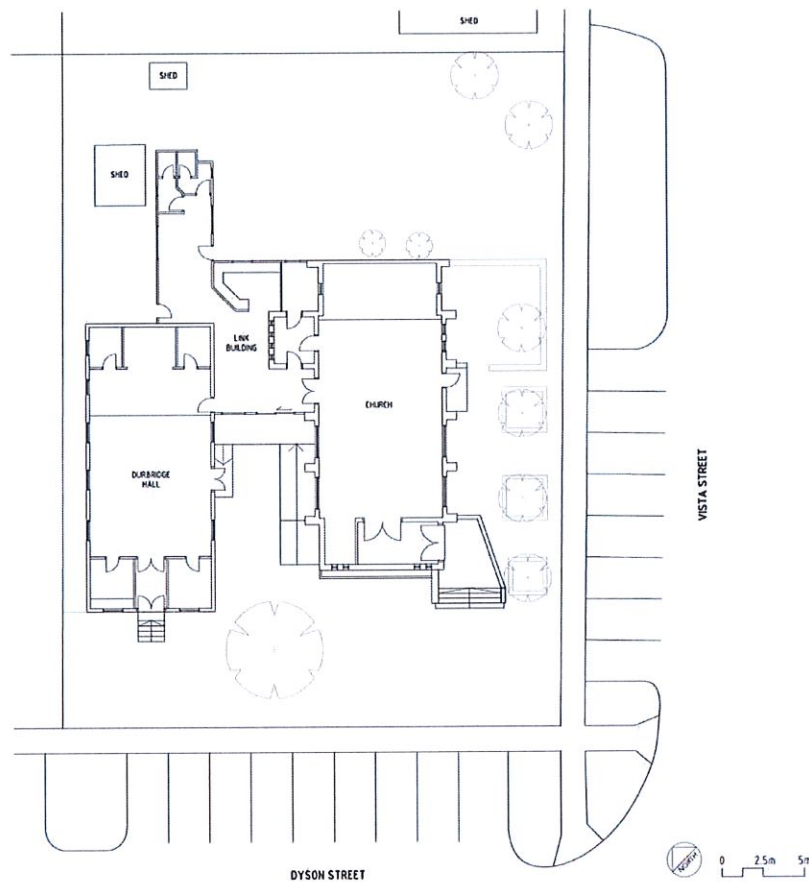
Plan of hall and church not to scale. *Griffiths Architects May 2021
